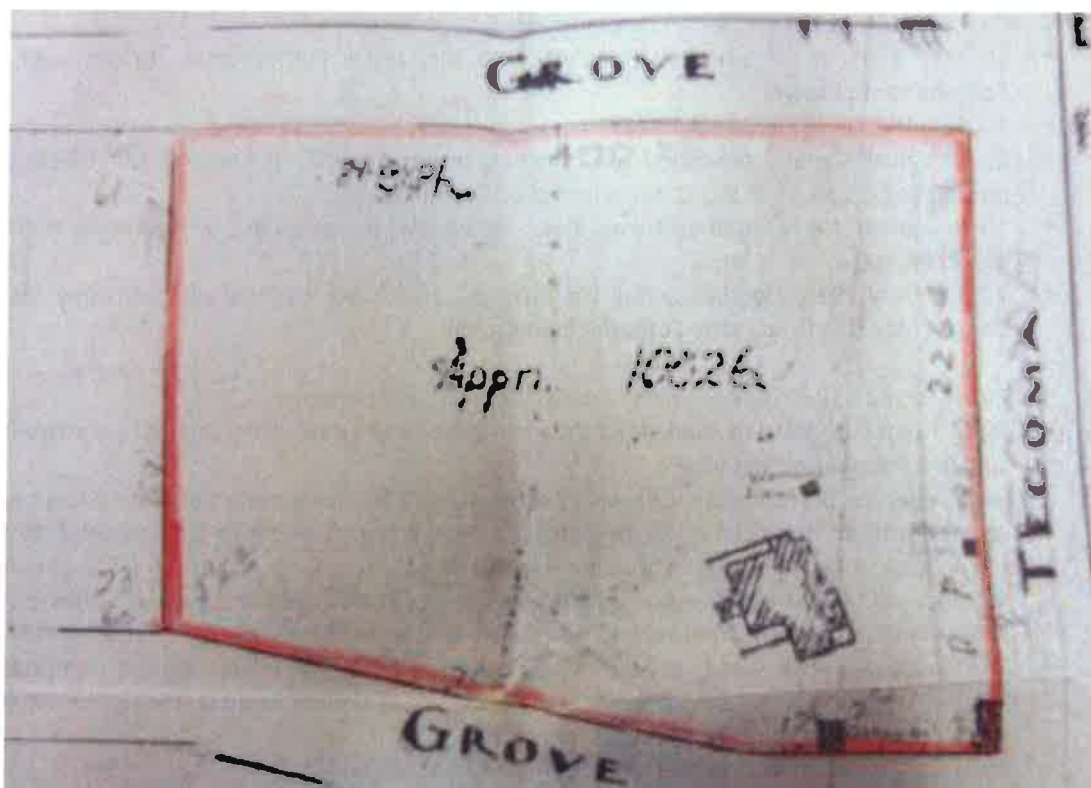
Site plan on blueprint copy of plan showing outbuildings surrounding the house. Note the plan is not to scale. North is at the top of the image. Heathcote Hall, Heathcote, CRS 459/1, NAA, 518/1/1714, cf Anne Ware Heritage Consulting 2016: 43.
